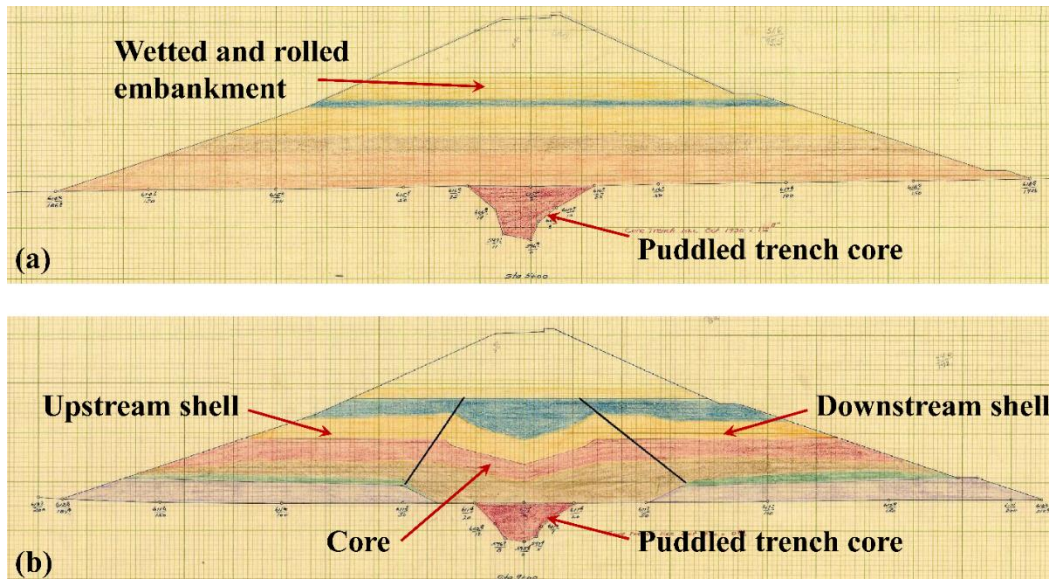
As-built drawing showing typical (a) wetted and rolled section and (b) hydraulic-fill section having a distinct core.
